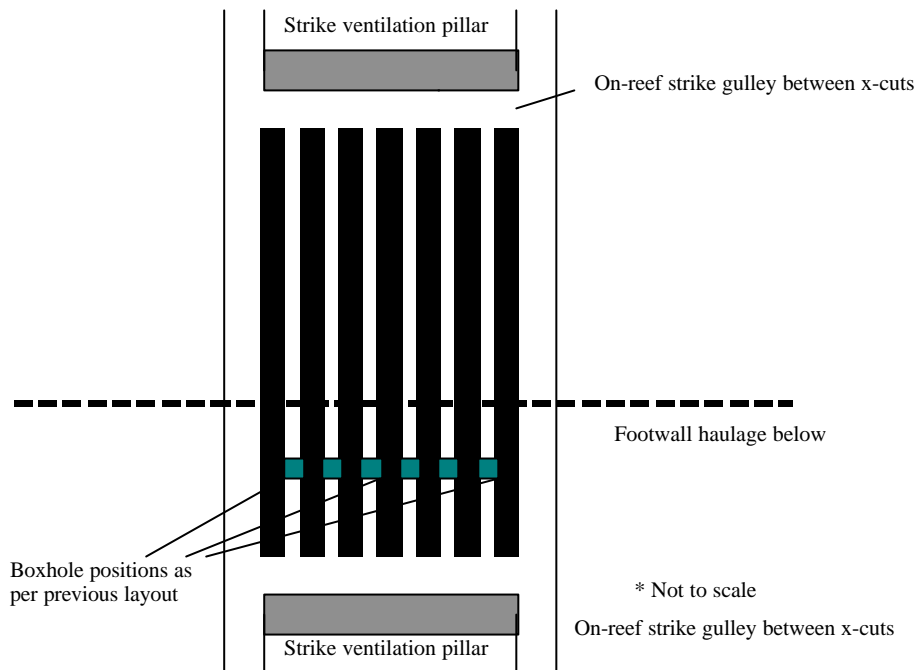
Airflow arrangement for bord and pillar layout (pre-developed).
